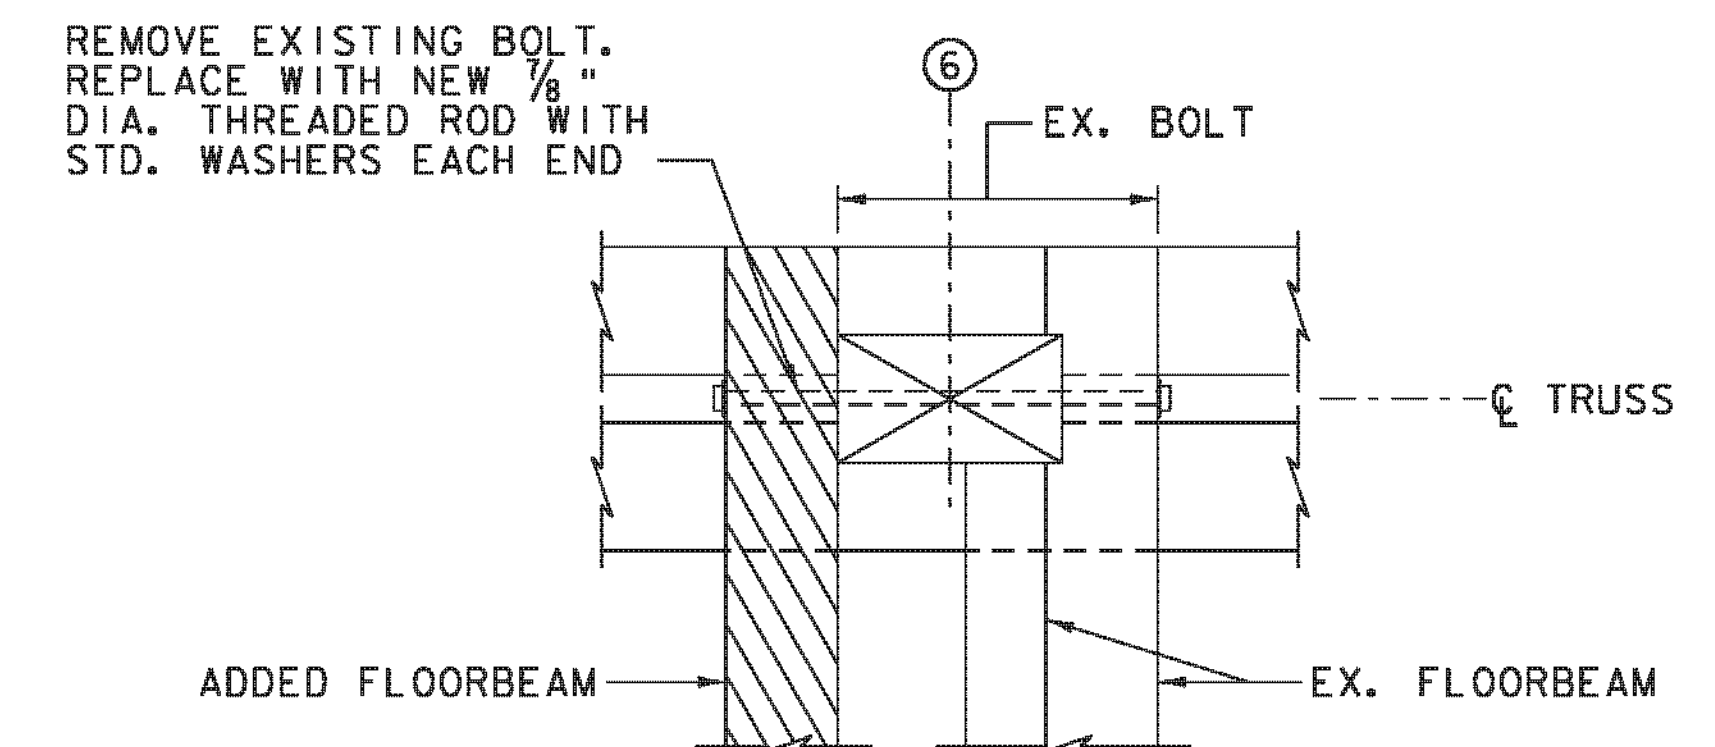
SECTION AT INTERMEDIATE FLOORBEAMS
